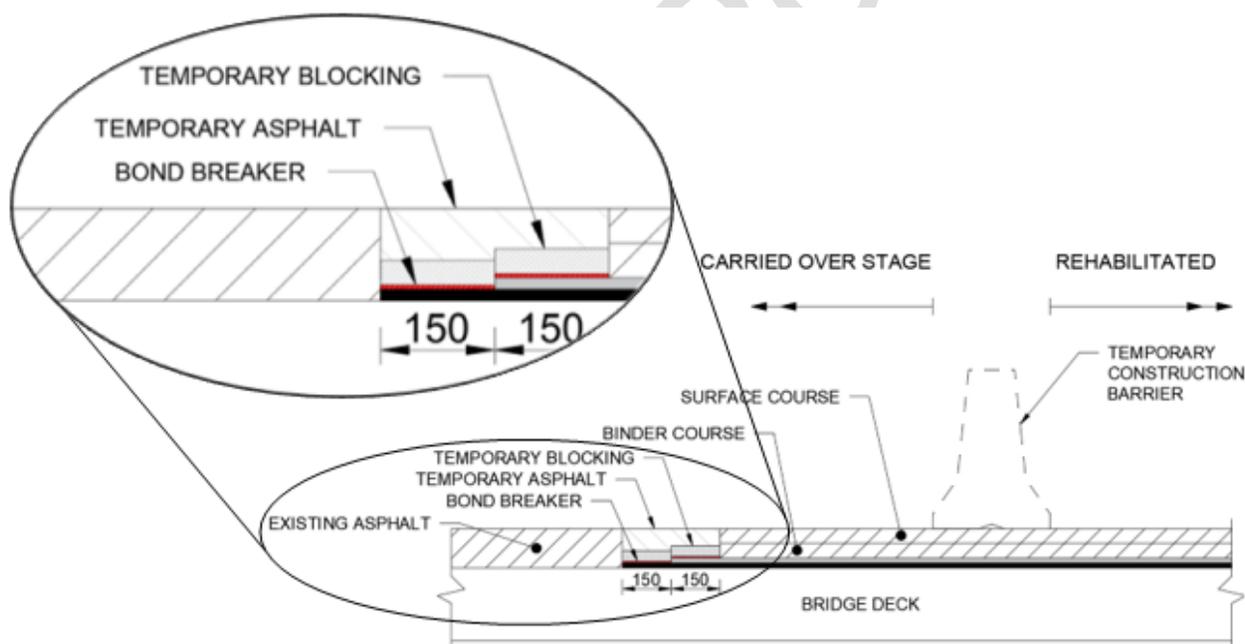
Typical waterproofing longitudinal joint detail for carryover construction.
